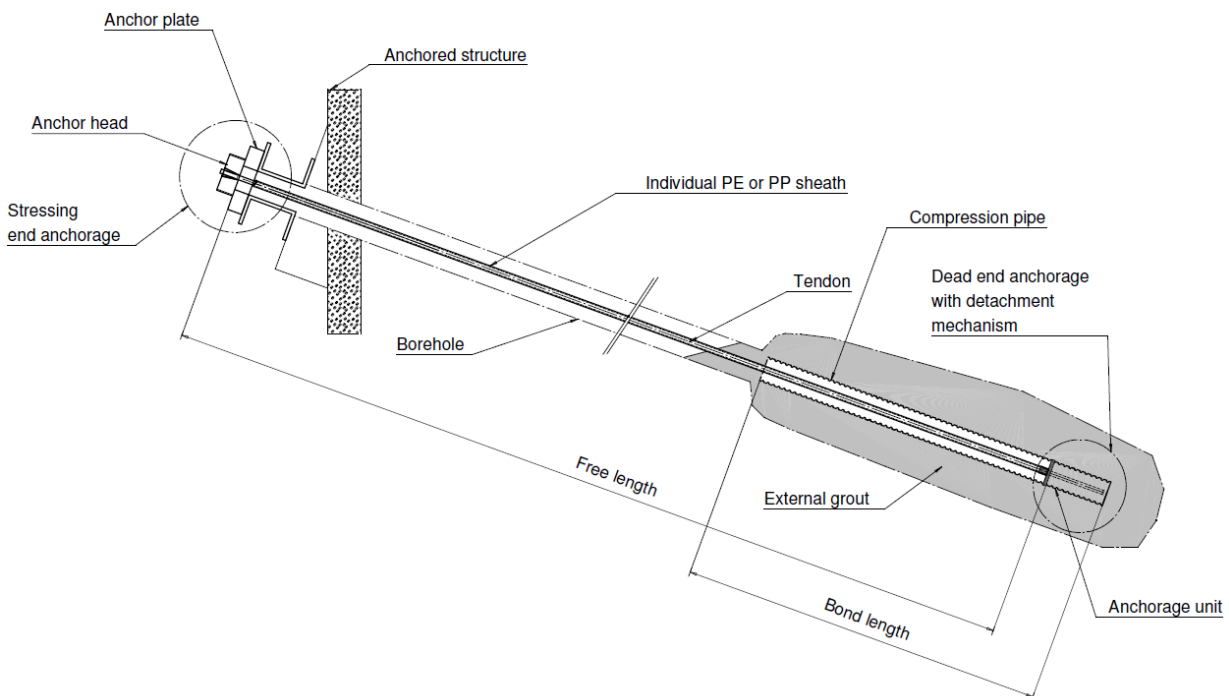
Rock and soil anchor – General schematic and terminology for PLC1 and PLC2
